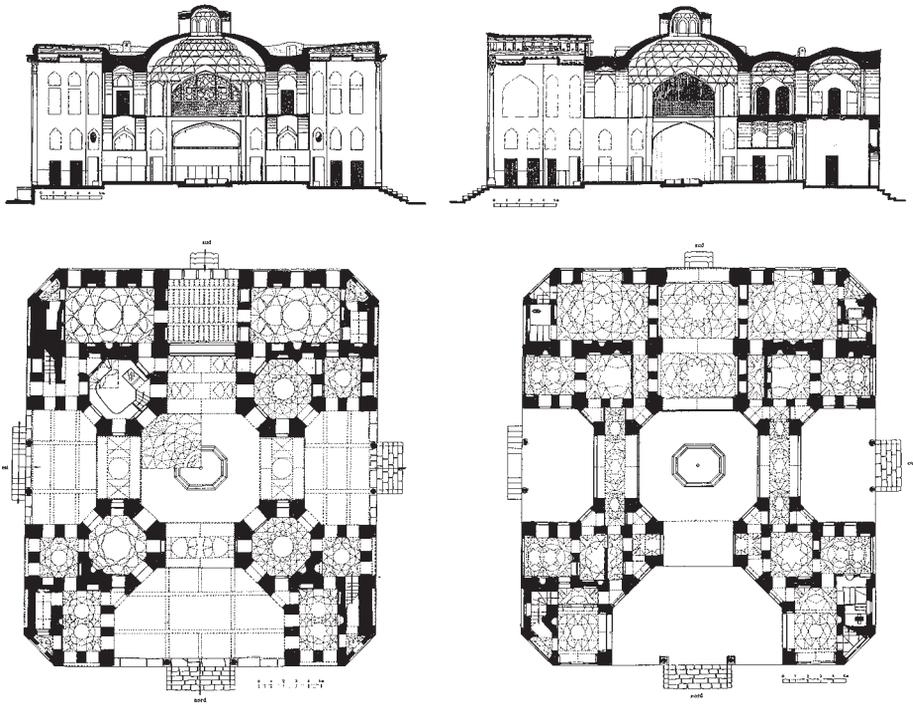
Isfahan. Hasht Behesht. Safawid garden palace. Plans and sections of ground floor and upper story (after Zander/Ferrante, 1968).
